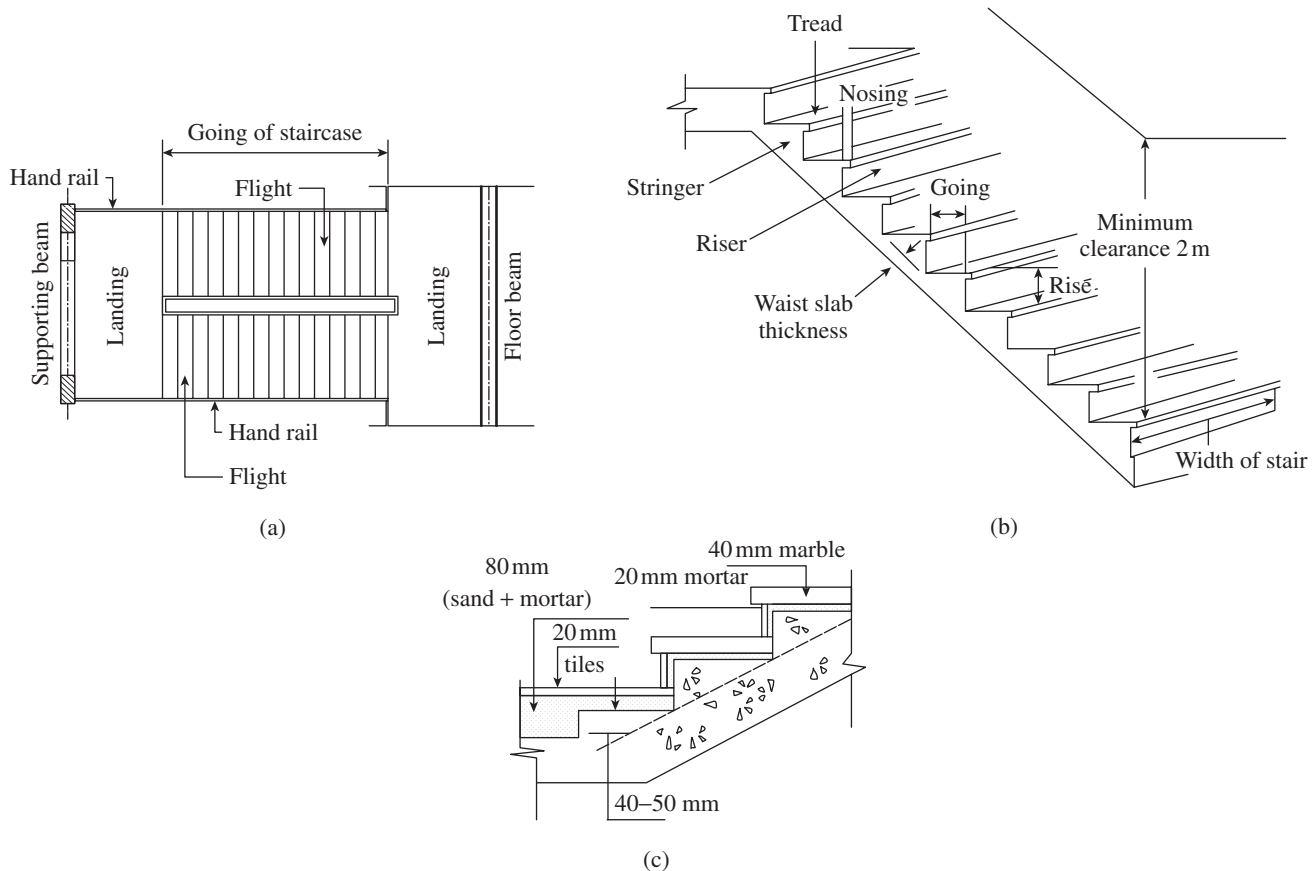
Components of a staircase (a) Plan of staircase (b) Terminology used (c) Part section
